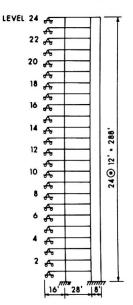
TWENTY-FOUR STORY STRUCTURE
